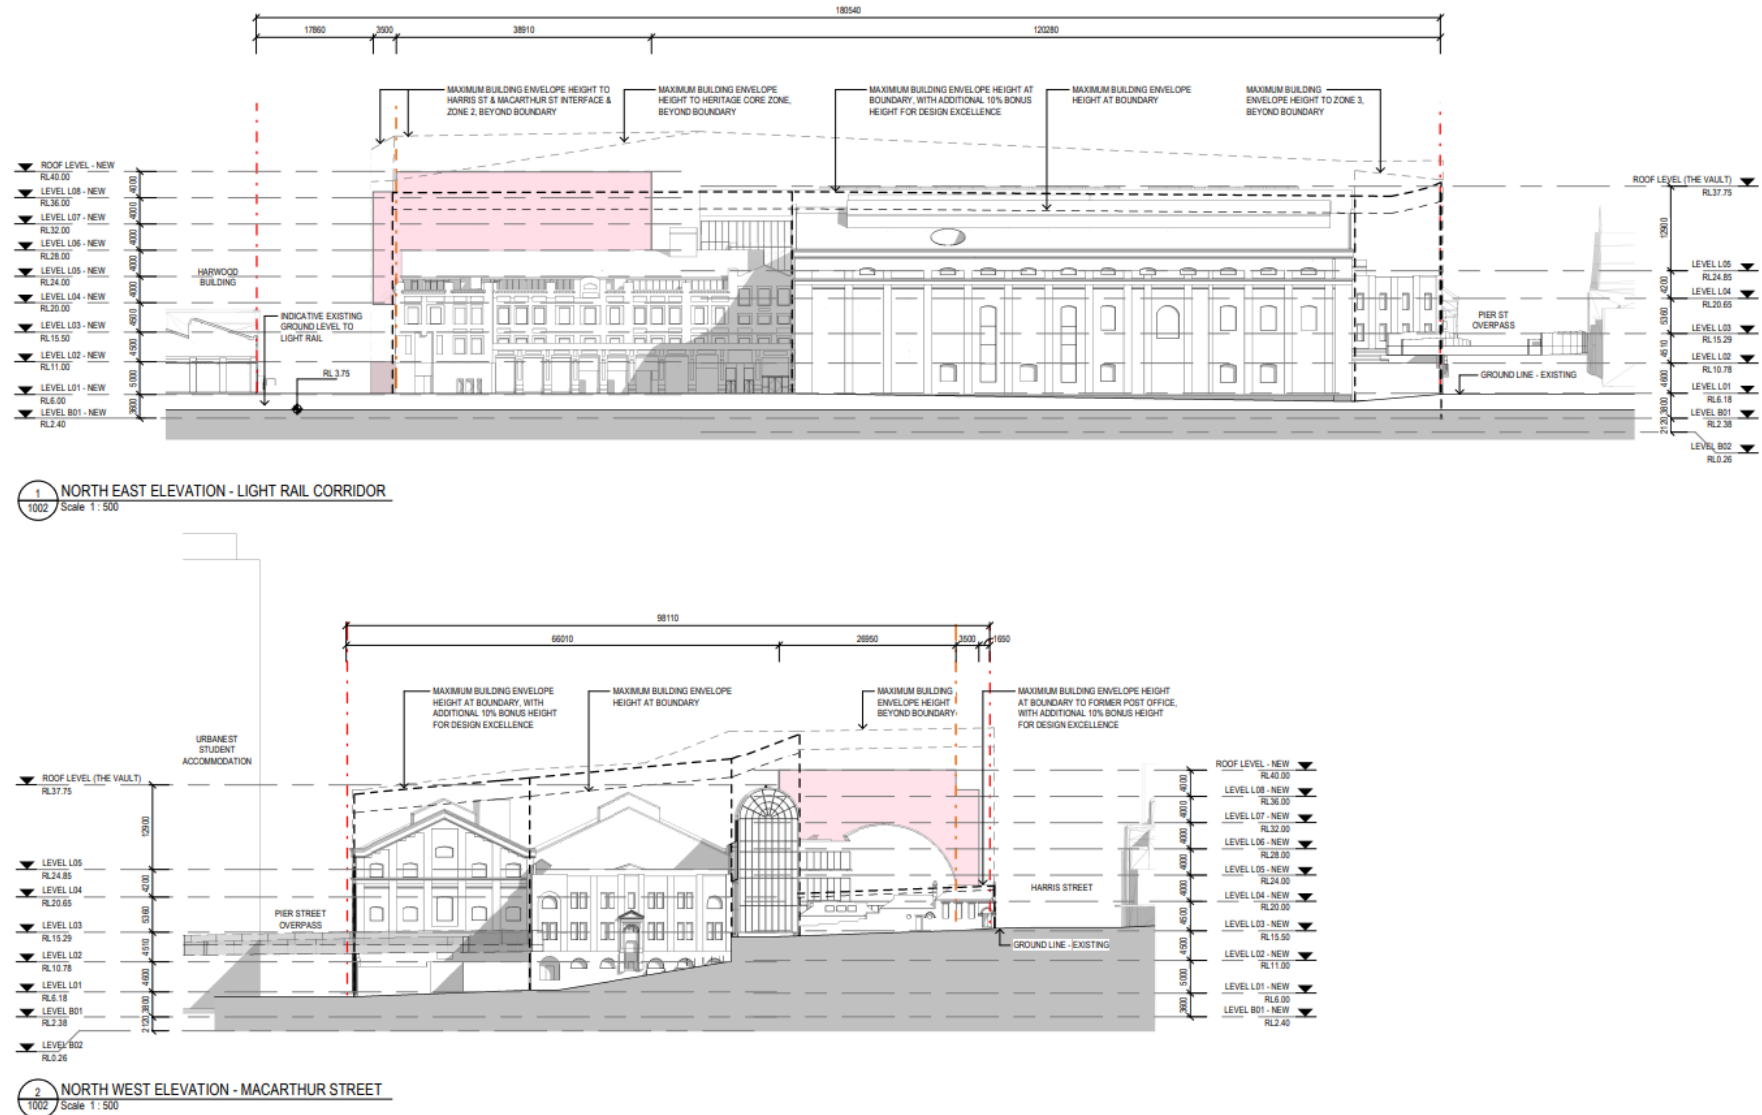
Ultimo Powerhouse- Reference Design NE & NW Elevations (Source: John Wardle Architects, 17 May 2022)
